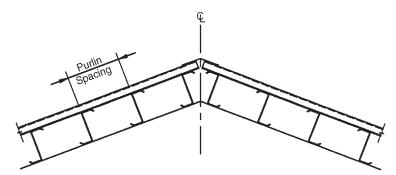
Typical purlin orientation in medium-sloped roofs.
